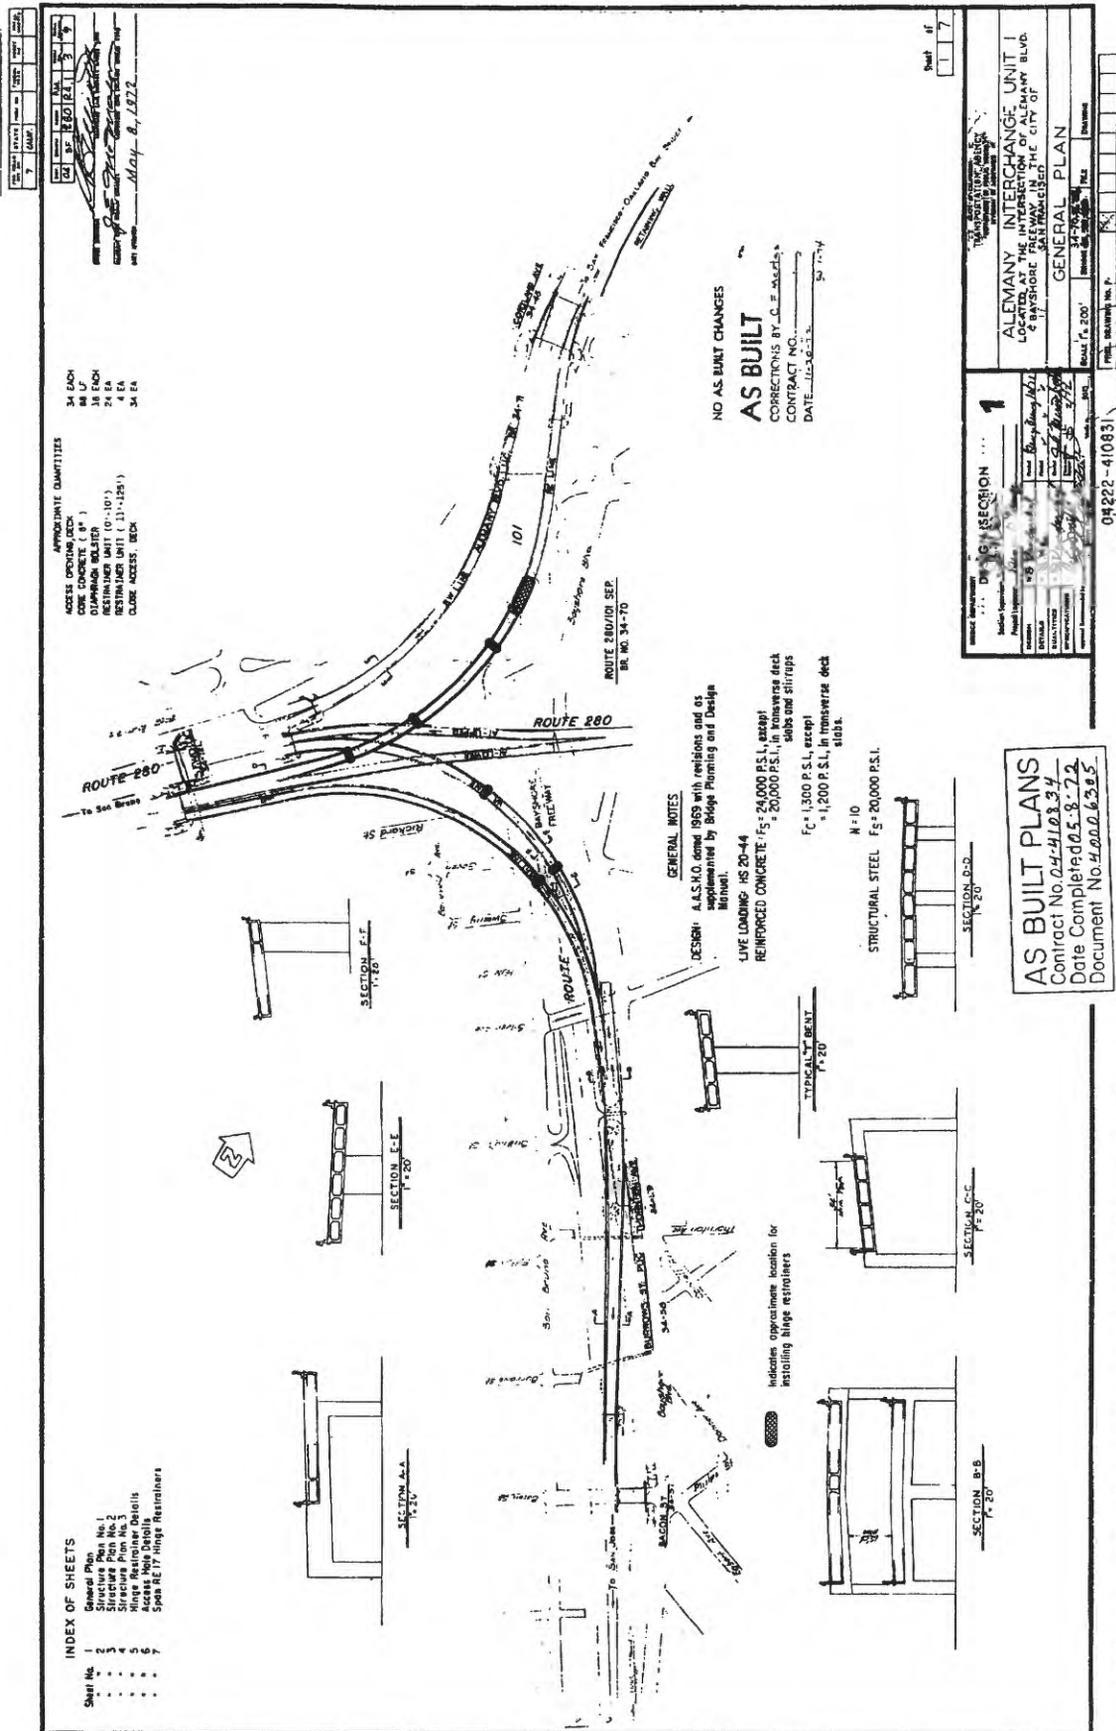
General Plan drawing showing alignment of Alemany Interchange.
